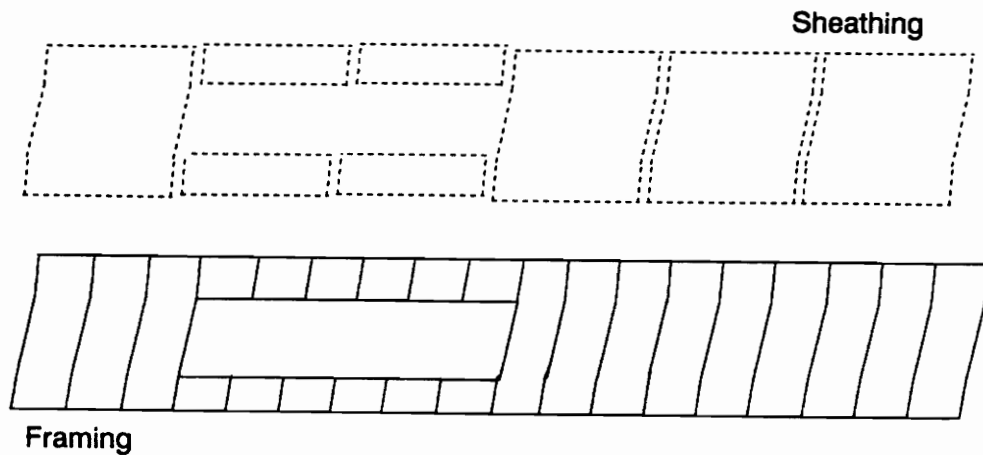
Typical Deflection Pattern of Shear Wall With Openings
